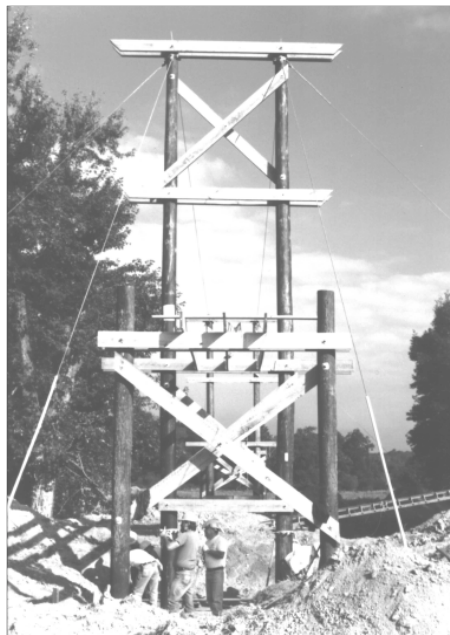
Same view as photo 16, but during foundation excavation. Note joist bracing and guylines. Photo courtesy of Mr. Tibor Latincsecs.
